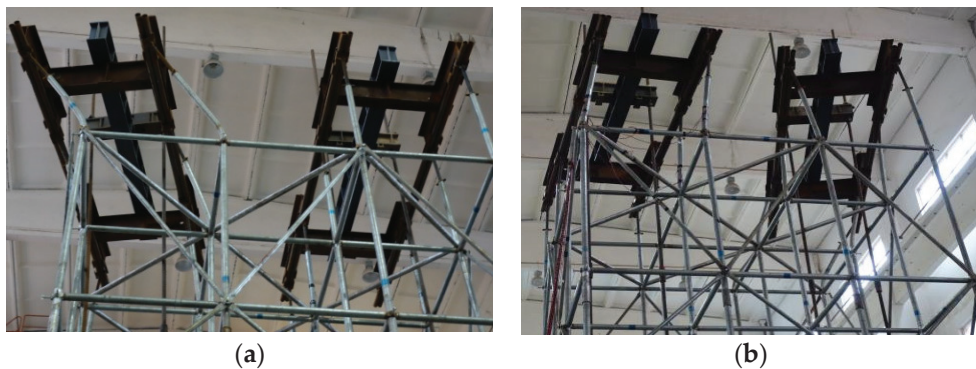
Instability morphology of scheme I. (a) West elevation. (b) East elevation.
